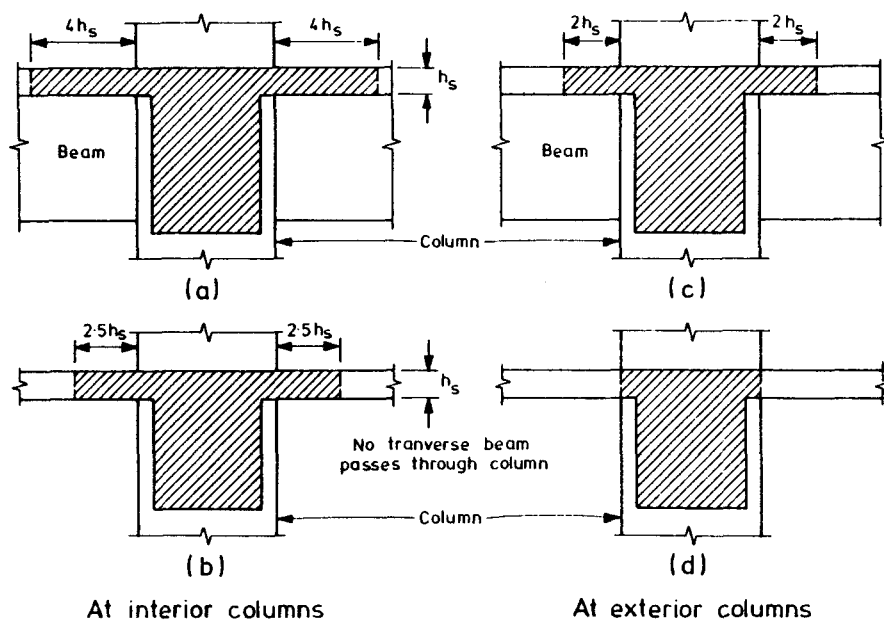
Longitudinal Steel in Shaded Area to be Included in the Flexural Strength of the Beam at Column Face [5].
